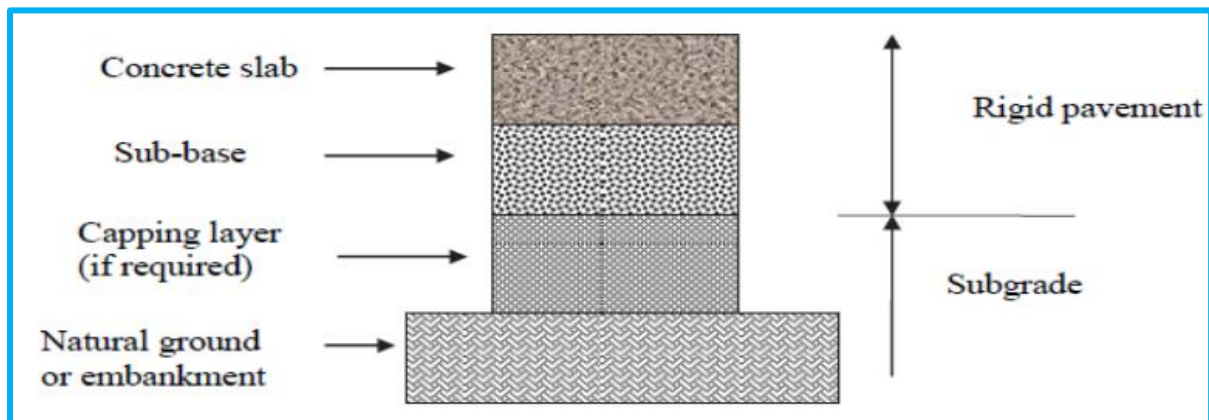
Rigid Pavement Structure (ERA Rigid Pavement DM, 2013)
